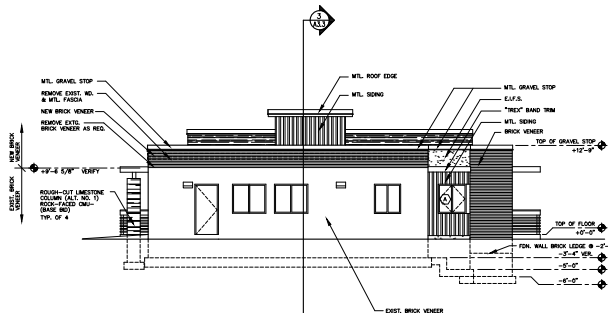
LONI East Elevation. From Waggoner and Wineinger Architects.
